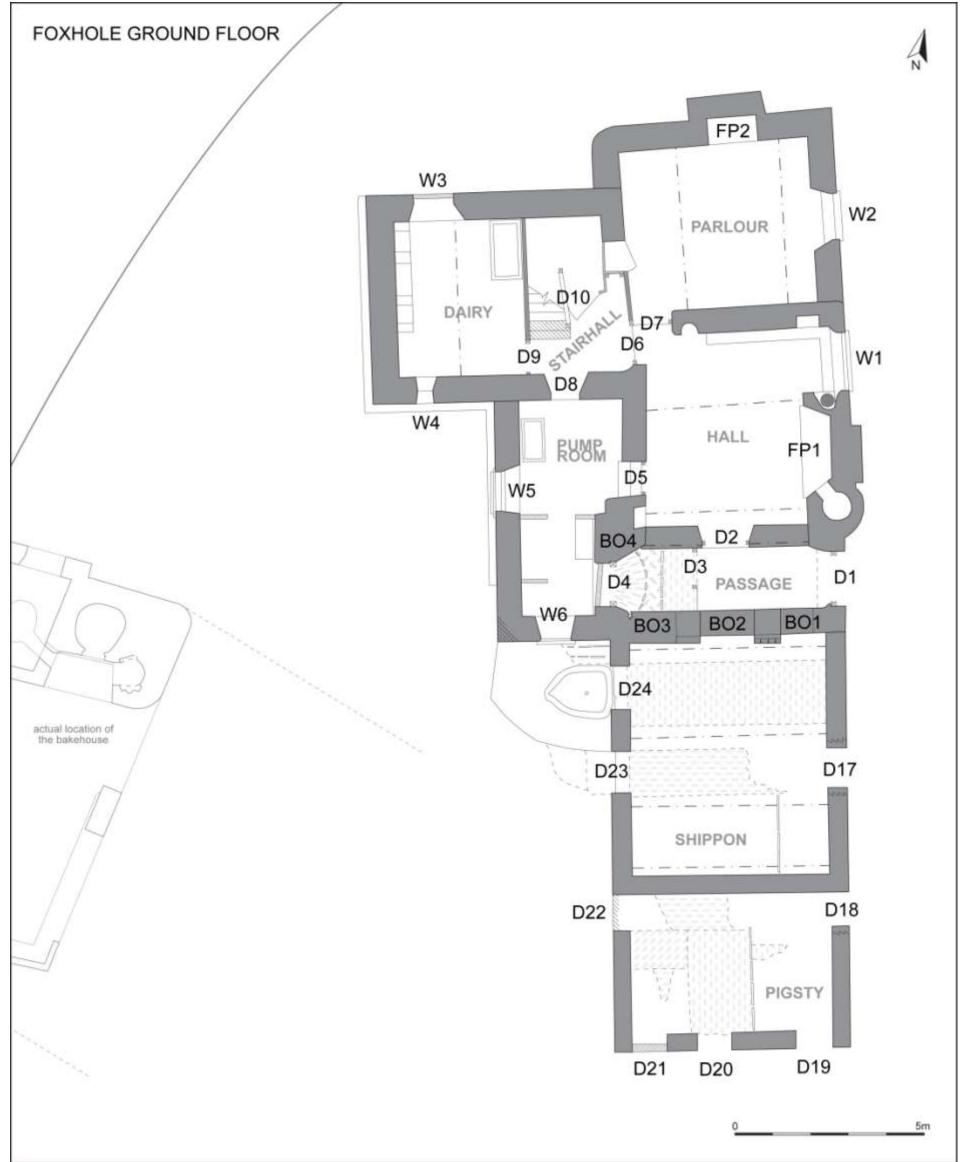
GROUND FLOOR PLAN SHOWING DOOR (DX), WINDOW (WX) AND FIREPLACE (FPX) NUMBERS.
